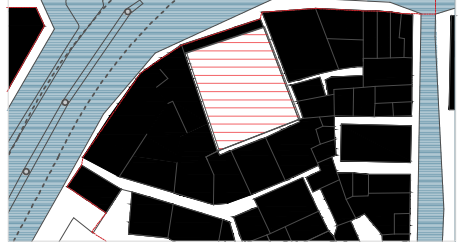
LAKSHMI BUILDING - PLAN & ELEVATION - Scale: 1:500
